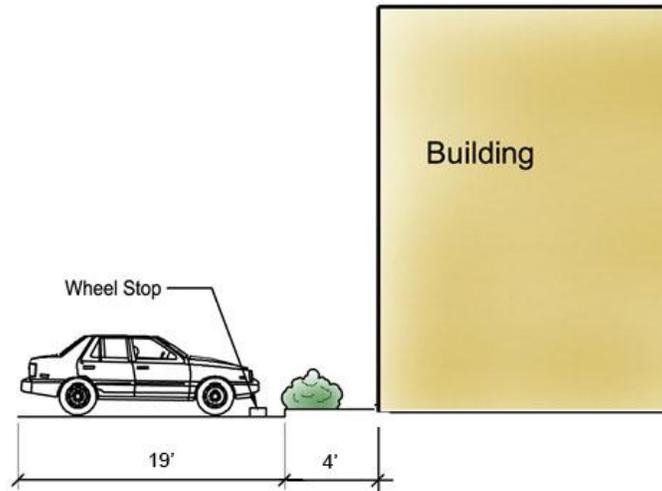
B: Minimum setback for parking (continuous curb or wheel stop) from a building or wall.
